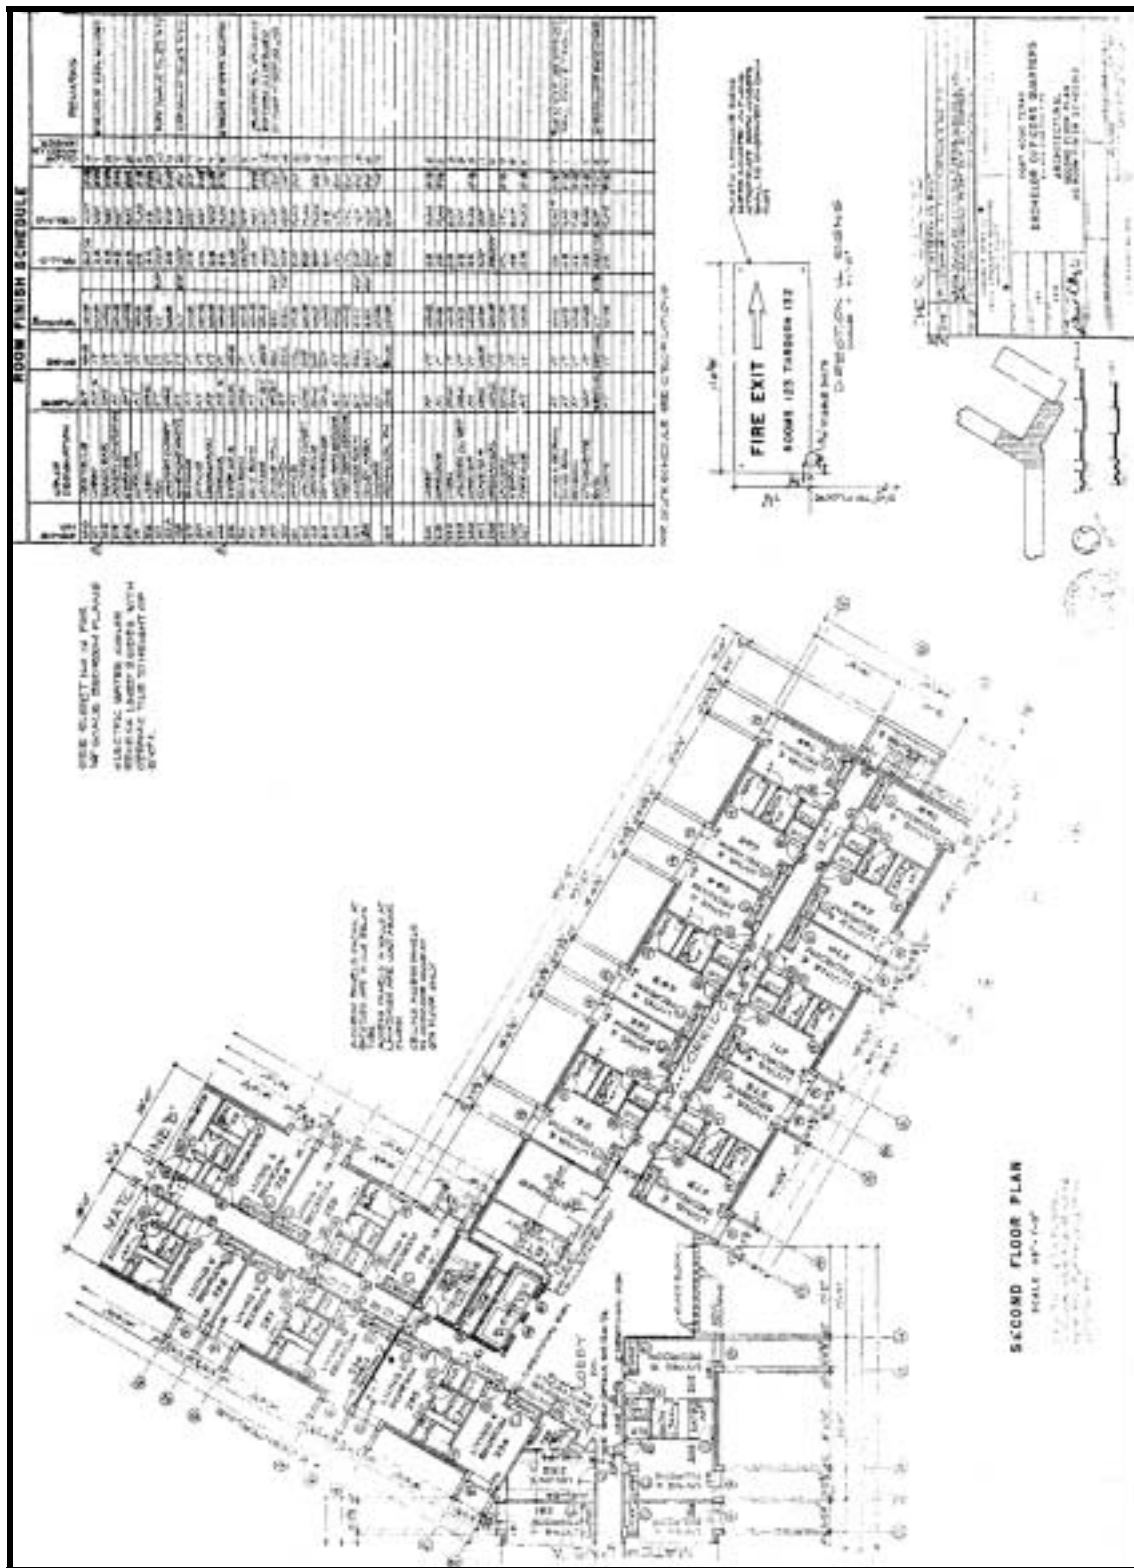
High Rise BOQ, Keith Ware Hall, second floor plan-core, Ft. Hood (ca. 1967, revised 1970) (Engineering, Ft. Hood).
